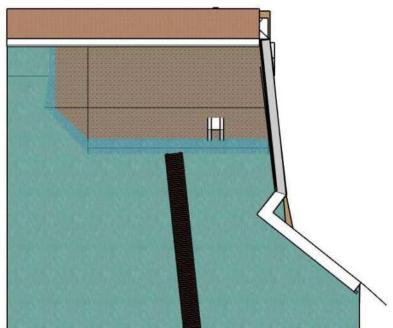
Proposed conceptual seawall revetment at Bart's Corner, plan view.
